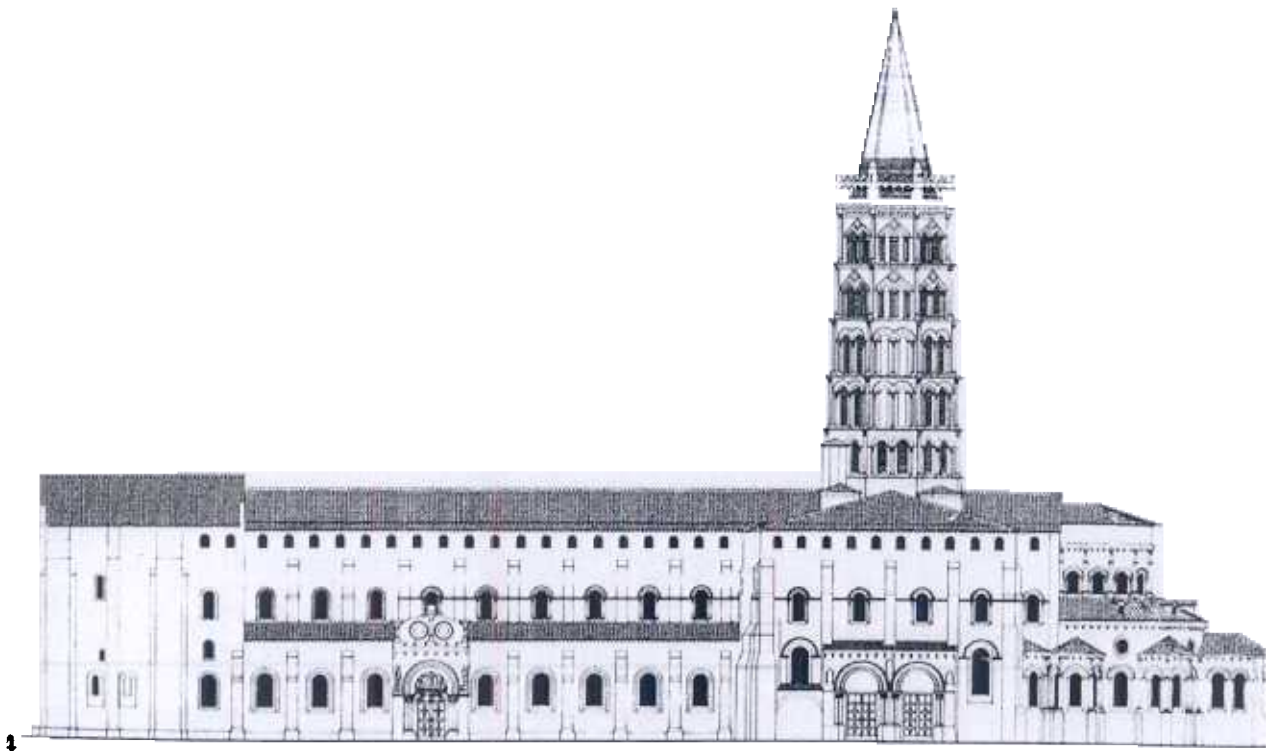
Toulouse, Saint-Sernin; south elevation of the proposed 'derestoration'.
